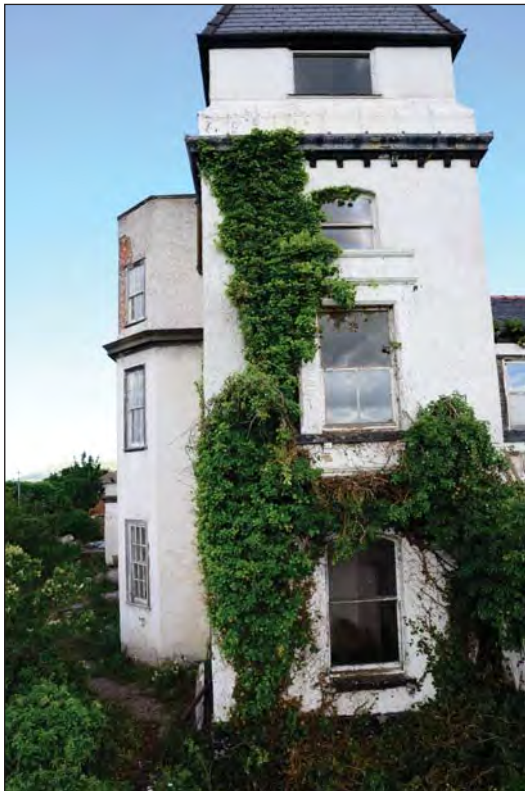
The 1919 Extension & 1860's Tower Southern Elevation
